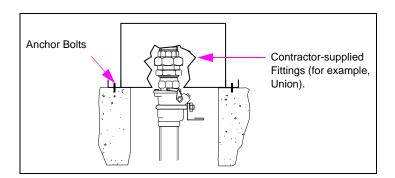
Anchoring Shear Valve Using Anchor Brackets
